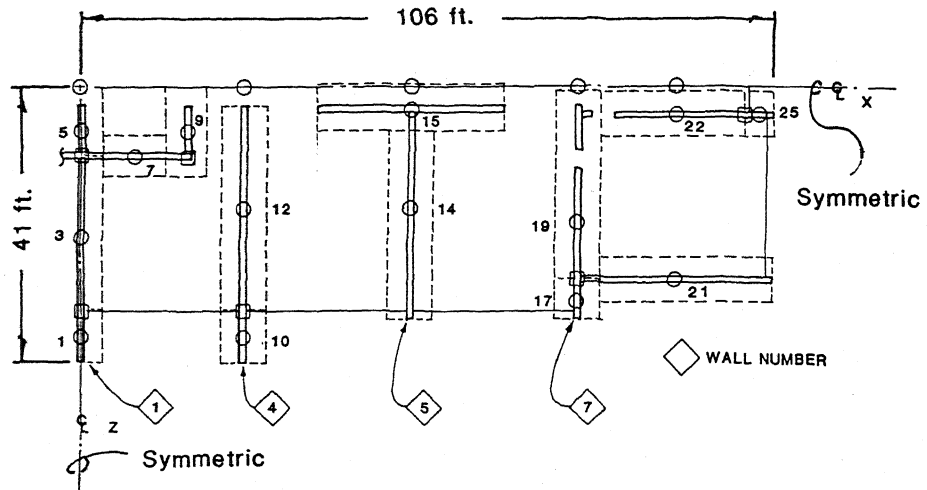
One-Quarter Plan Showing Arrangement of Walls and Foundations
